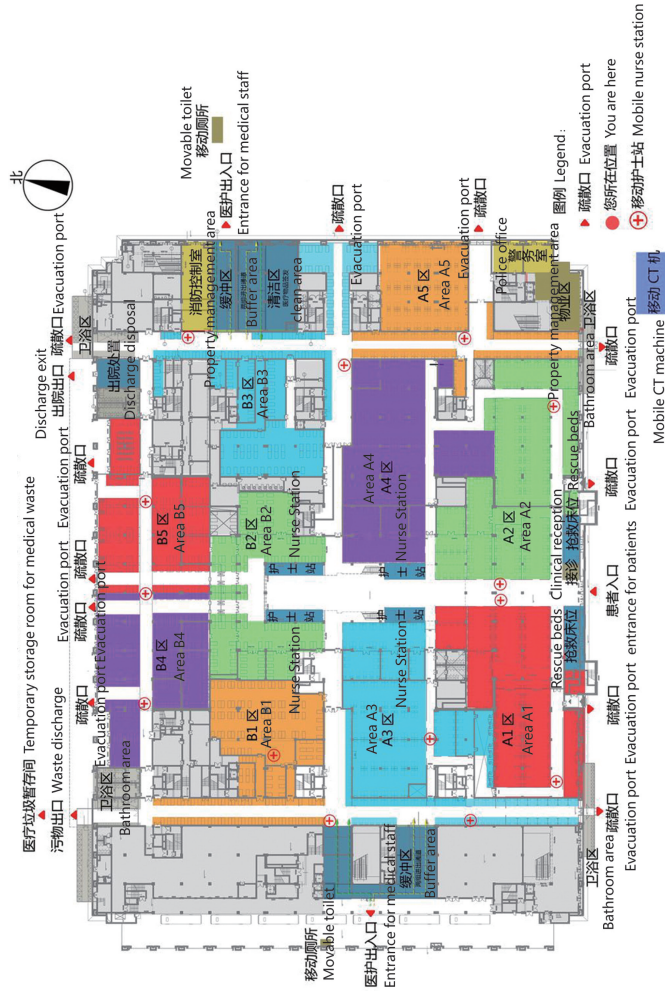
Zoning plan of Zall (North Hankou) Fangcang Shelter Hospital
